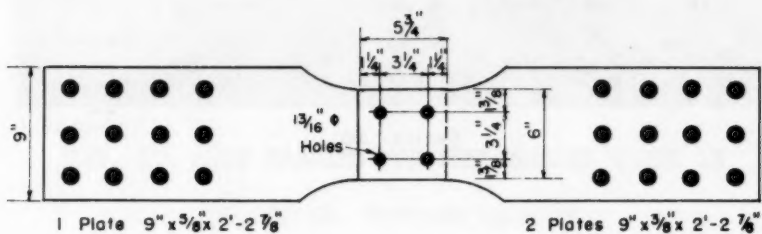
BOLTED FATIGUE TEST SPECIMENS OF BALANCED DESIGN, SERIES F
